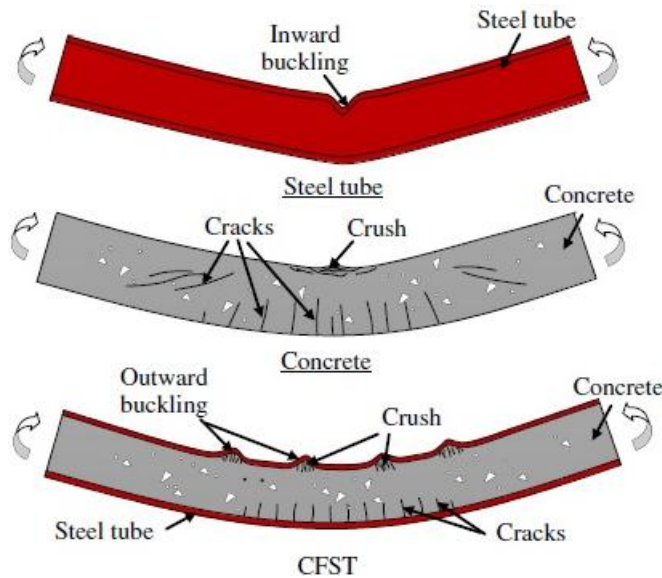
Typical failure modes of CFST beams compared to reinforced concrete and hollow steel tube beams (Han et al., 2014)
